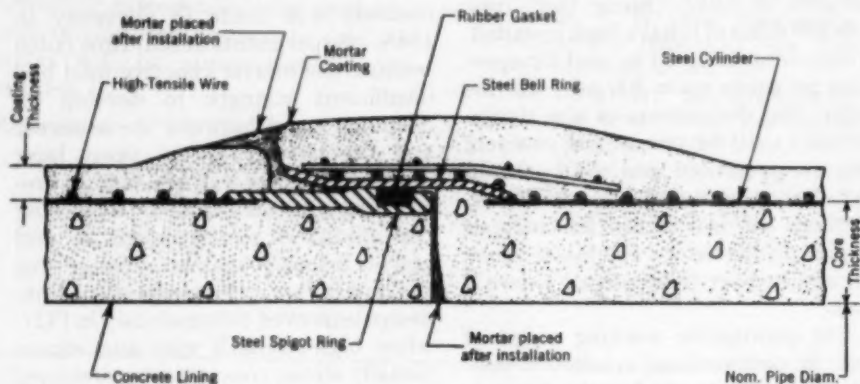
Prestressed Concrete Cylinder Pipe (Rubber and Steel Joint)
